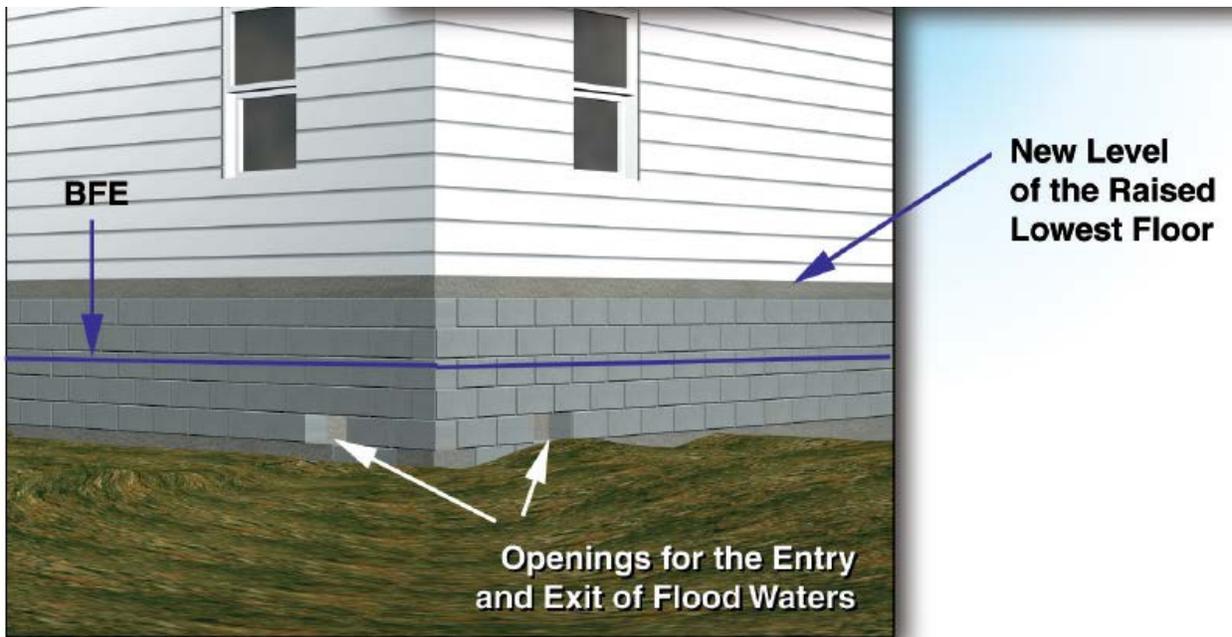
Building foundation is modified to raise the house to be one foot above the base flood elevation.
